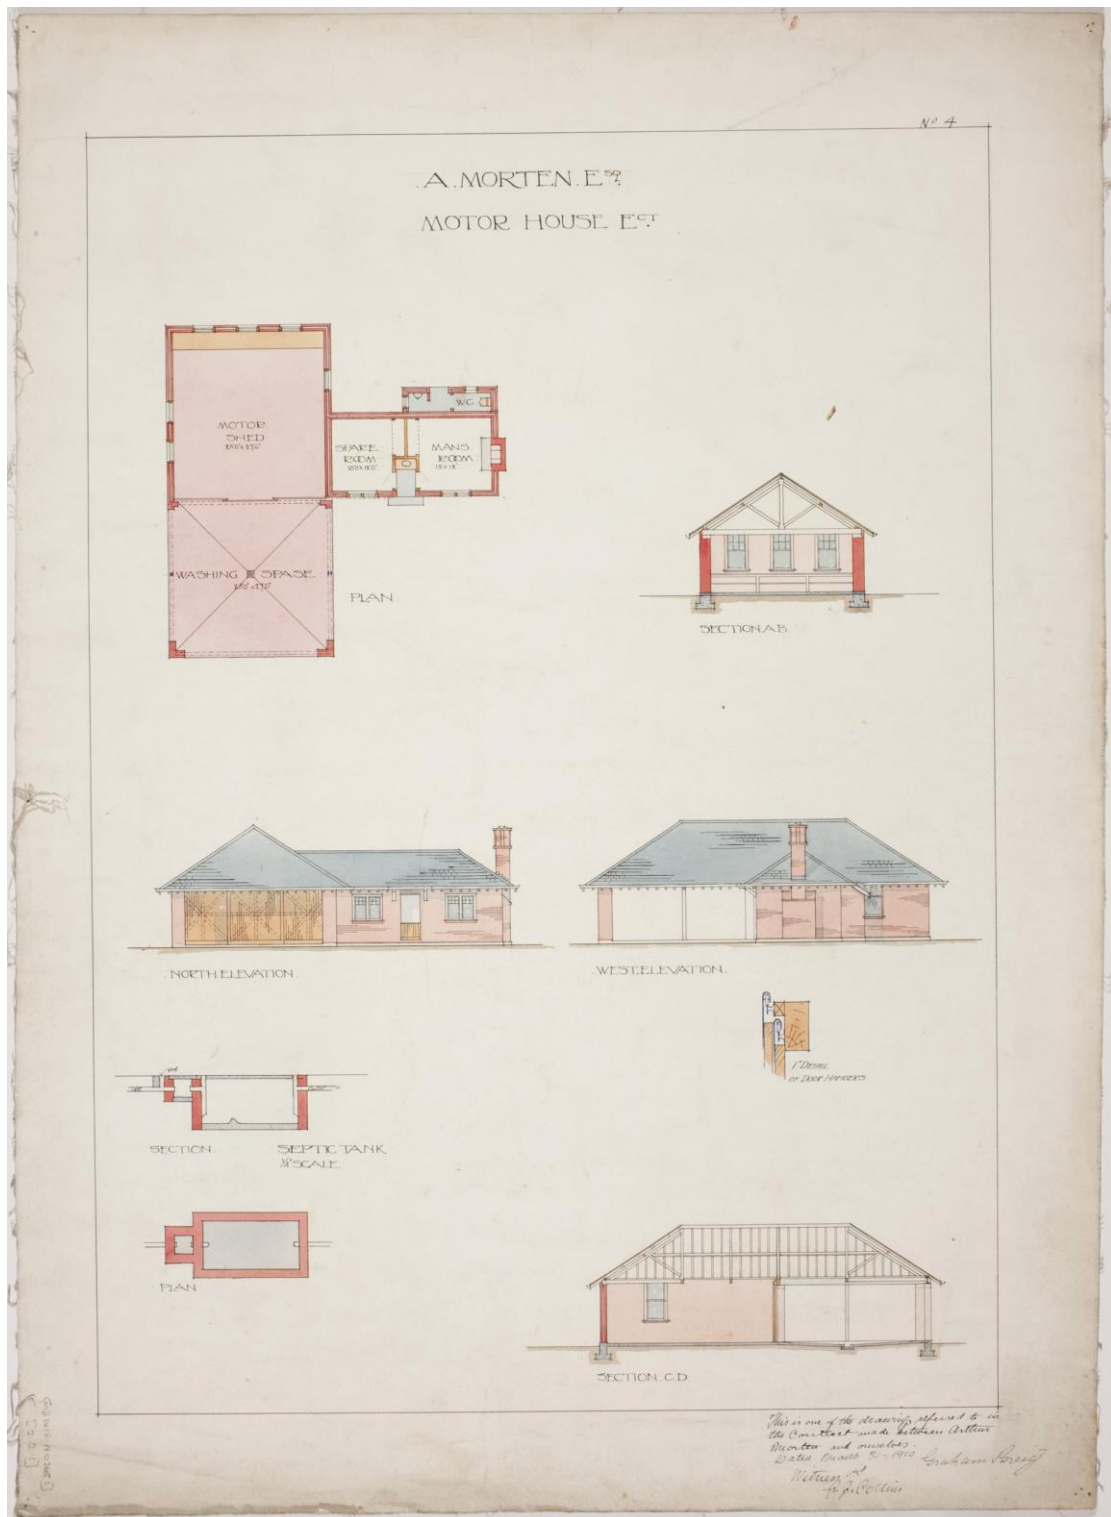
Collins and Harman, A. Morten, Esq., Motor House, Ect. [sic], plan, elevations and sections (1910).
